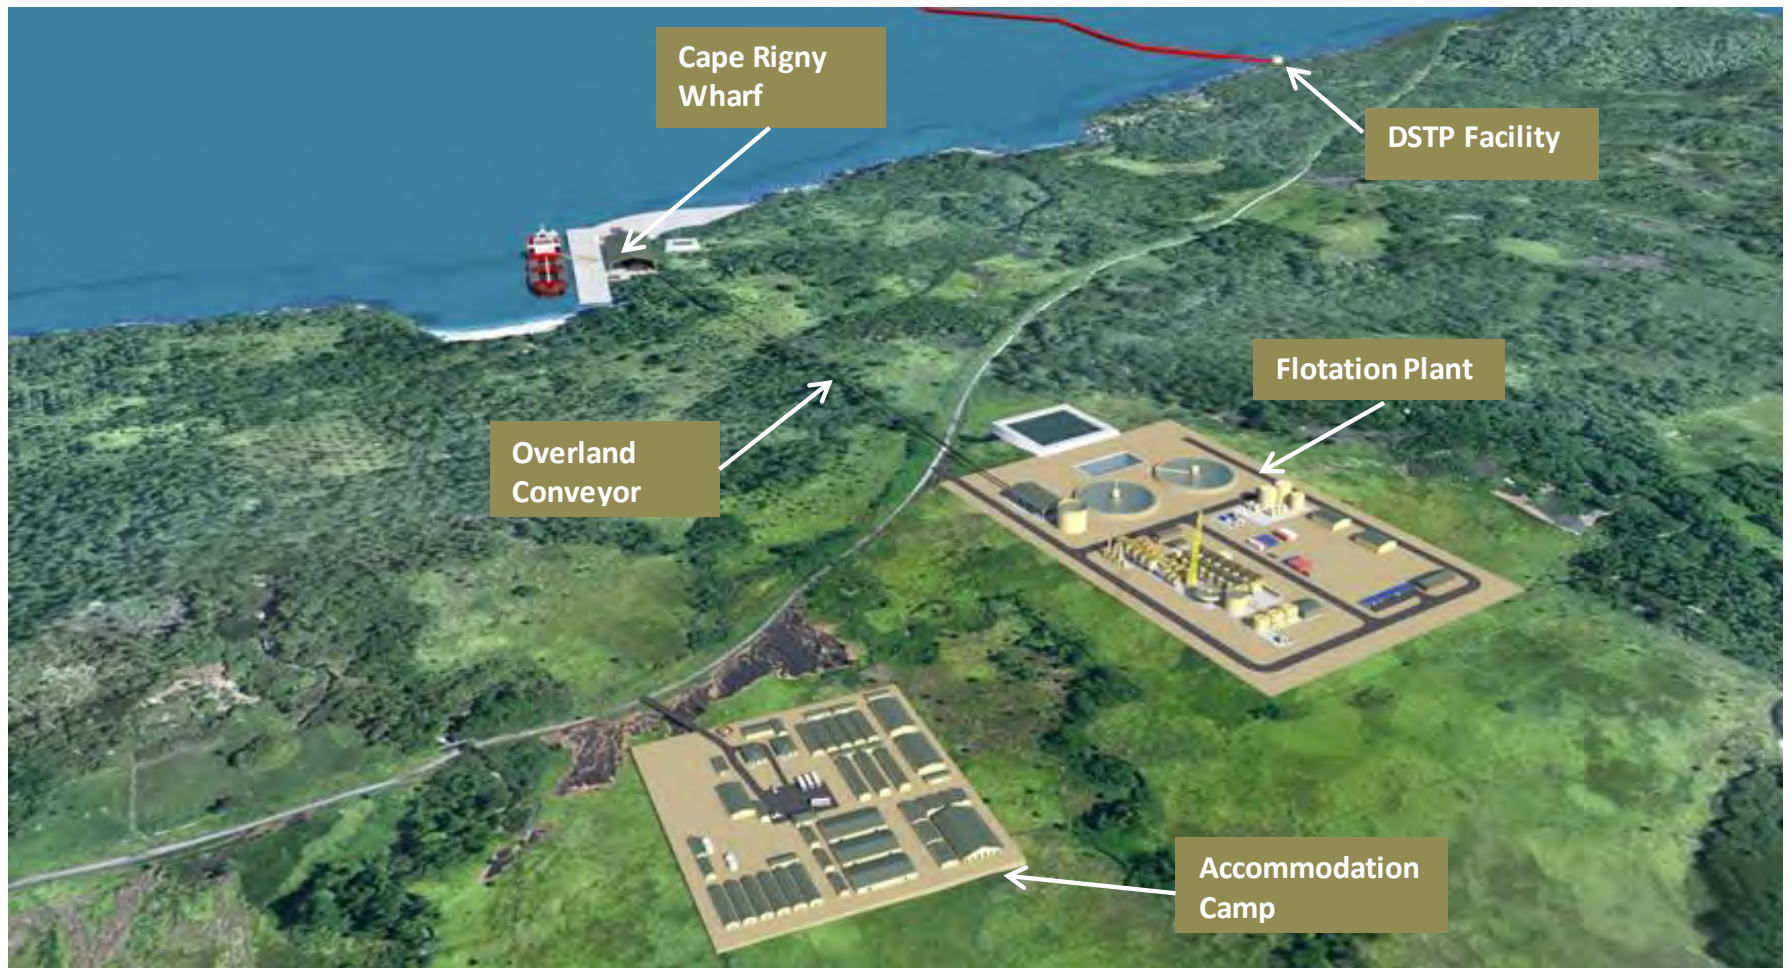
Conceptual Layout of Coastal Facilities at Cape Rigny
